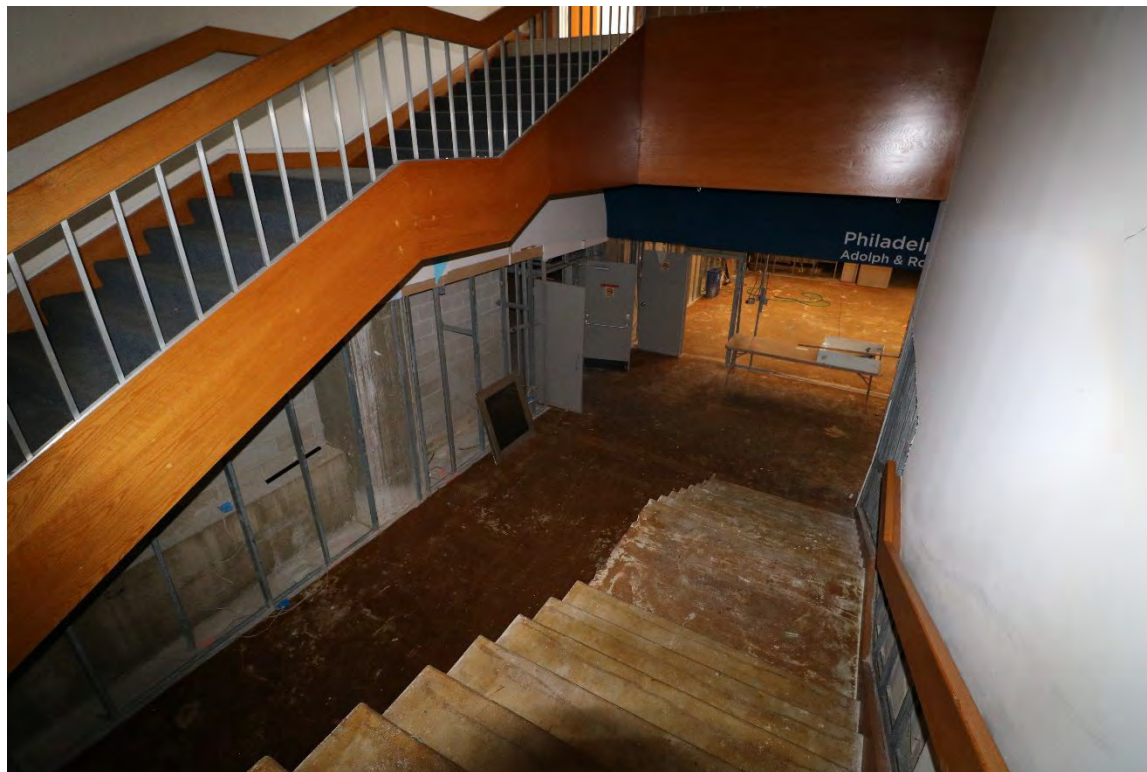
Interior, Basement, Stairwell, view looking northwest.
